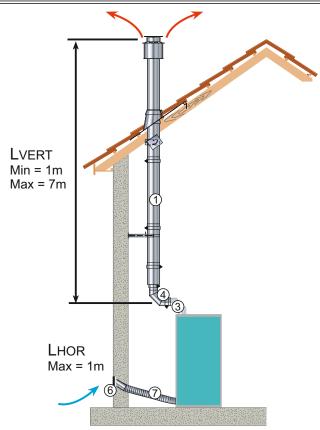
Fresh air from the facade - wall grille, chimney inside the boiler room
